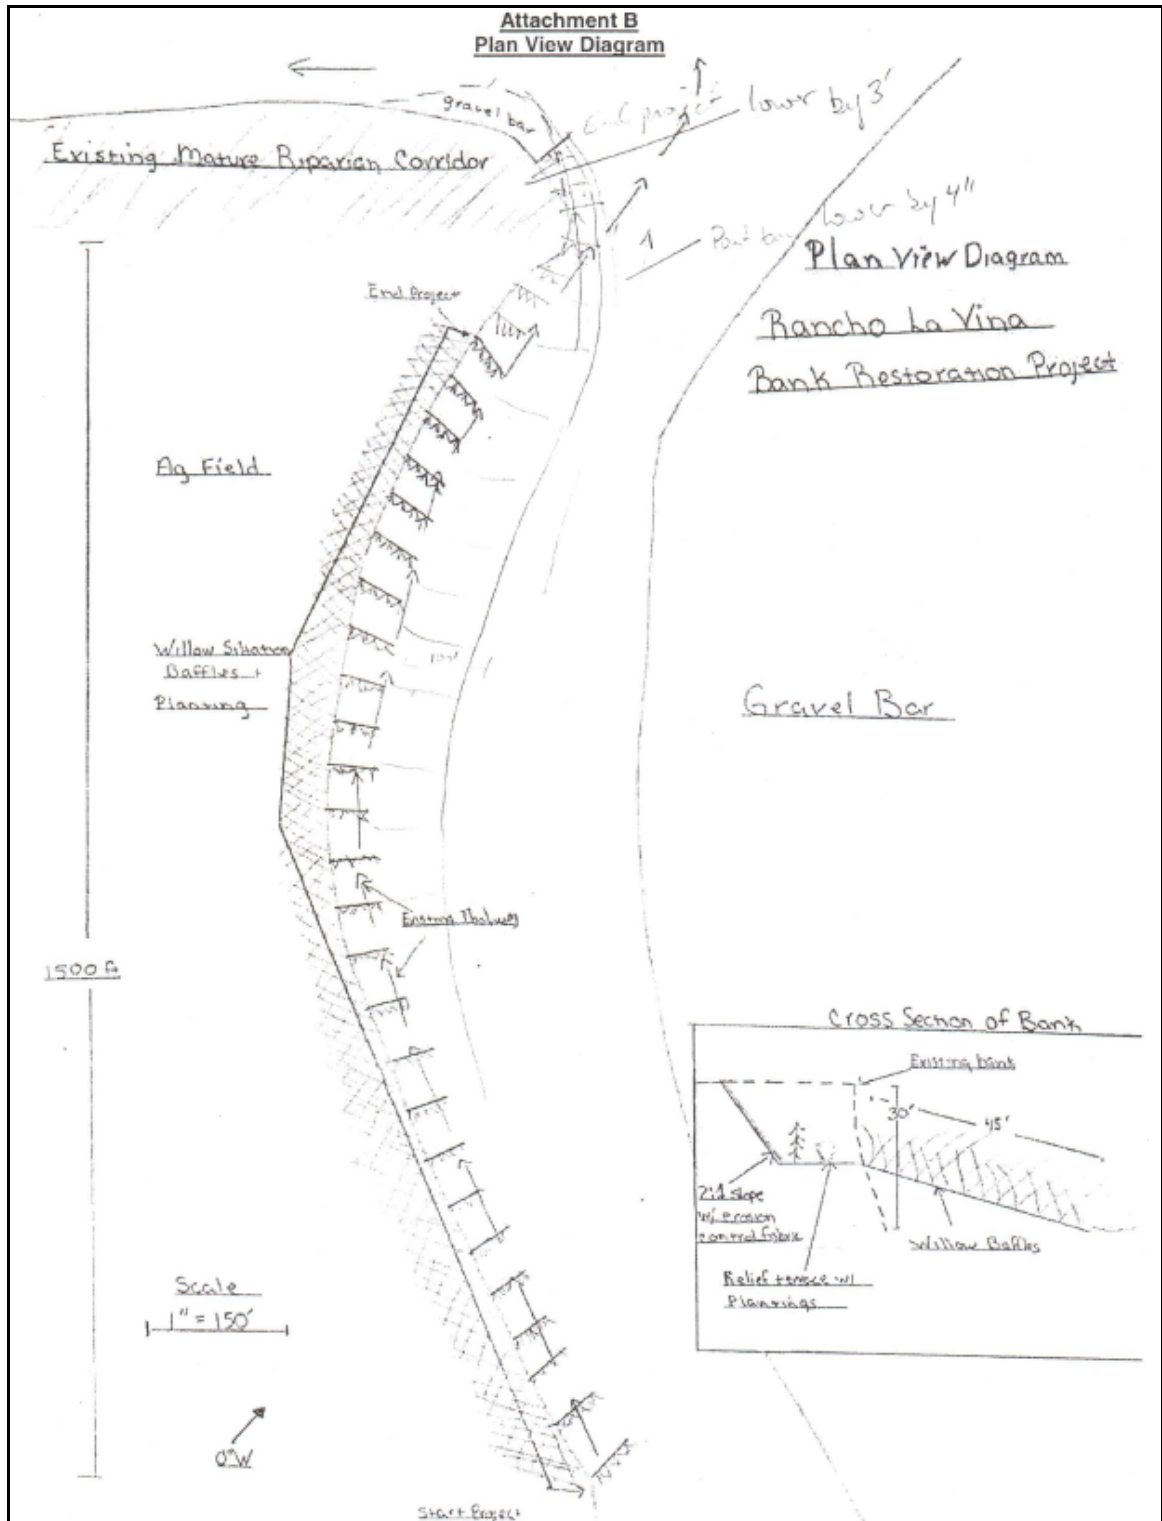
The design plans developed for construction of the project (*Land Trust, 2005*).
